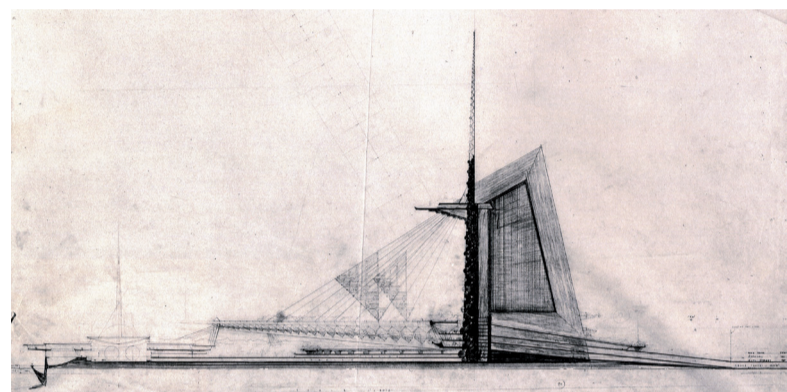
Side Elevation of Wright's Twin Suspension Bridges. 1948.
